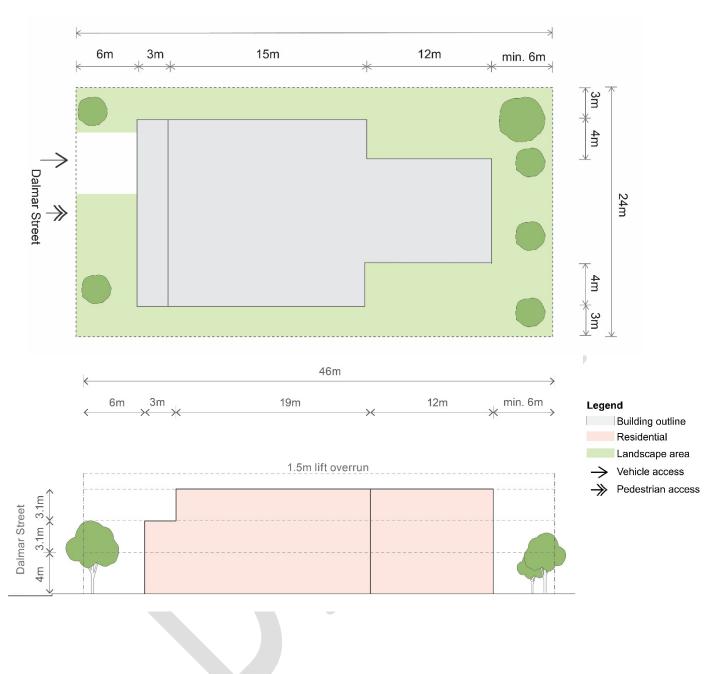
Indicative Type 1B Narrow Lot Infill for 56m lot depth – storeys, building envelope, scale and site layout requirements - plan and section views
